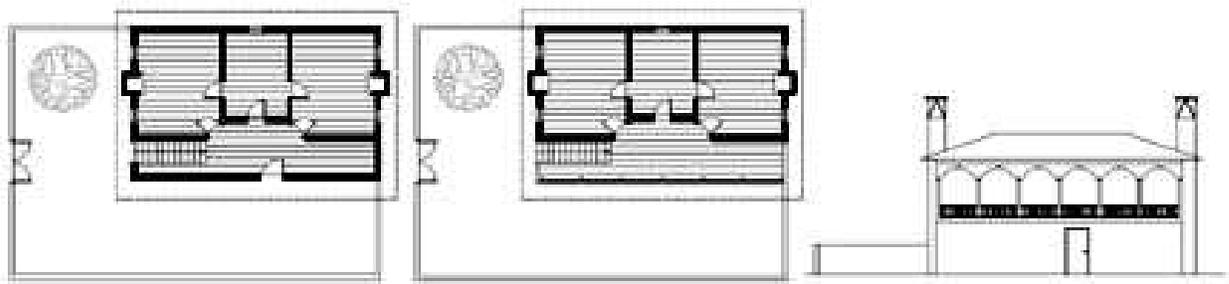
House Type 3a. Ground floor plan (left), first floor plan (middle), front elevation (right) (Drawings by author)
